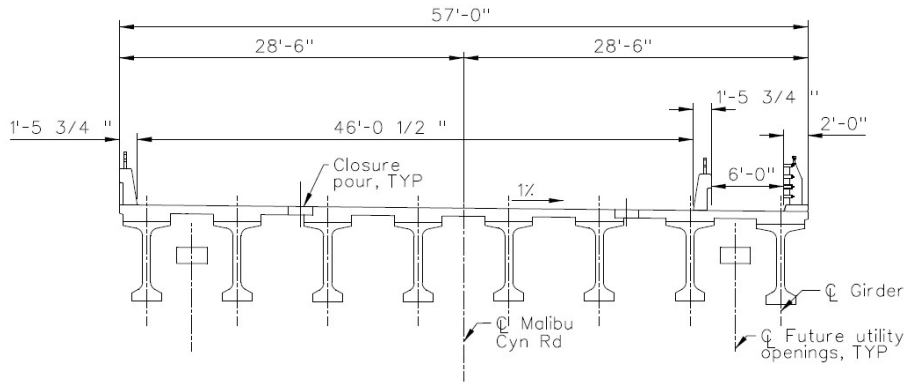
Typical Cross Section of the Proposed Bridge
